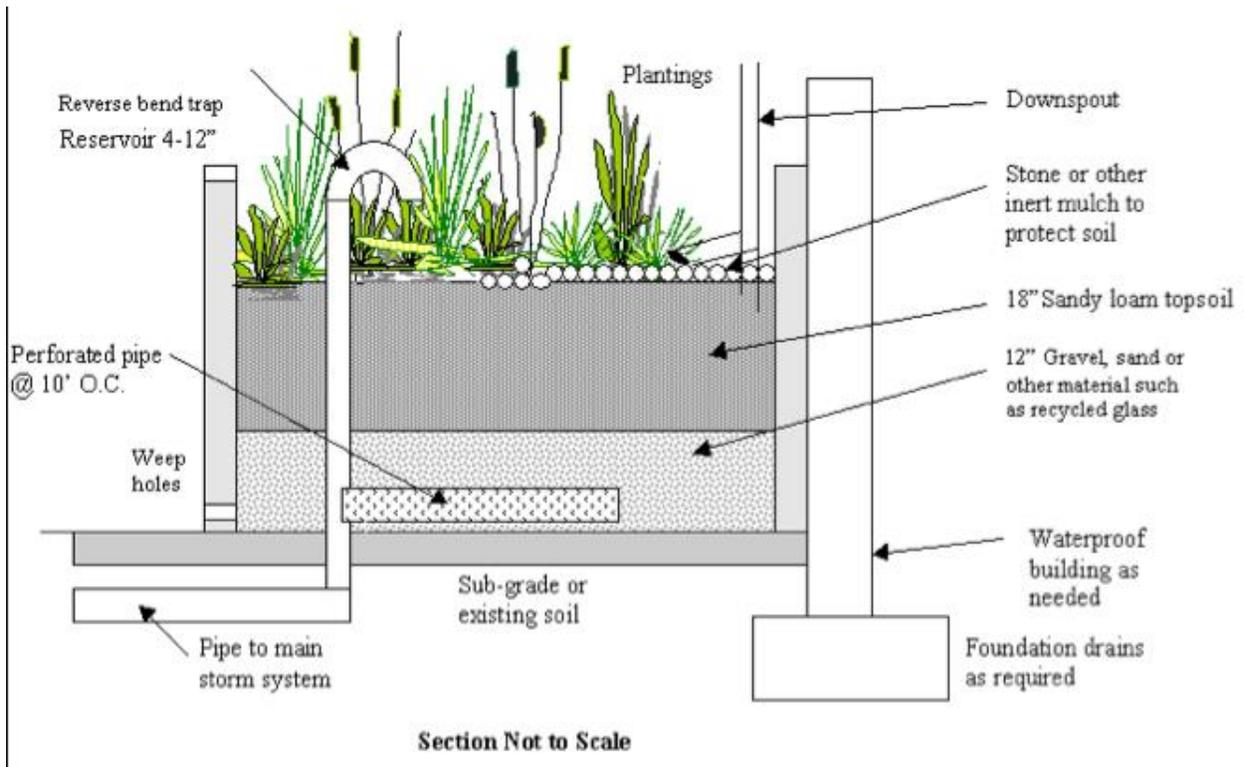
Example Stormwater Infiltration Planter Box Biofiltration System
